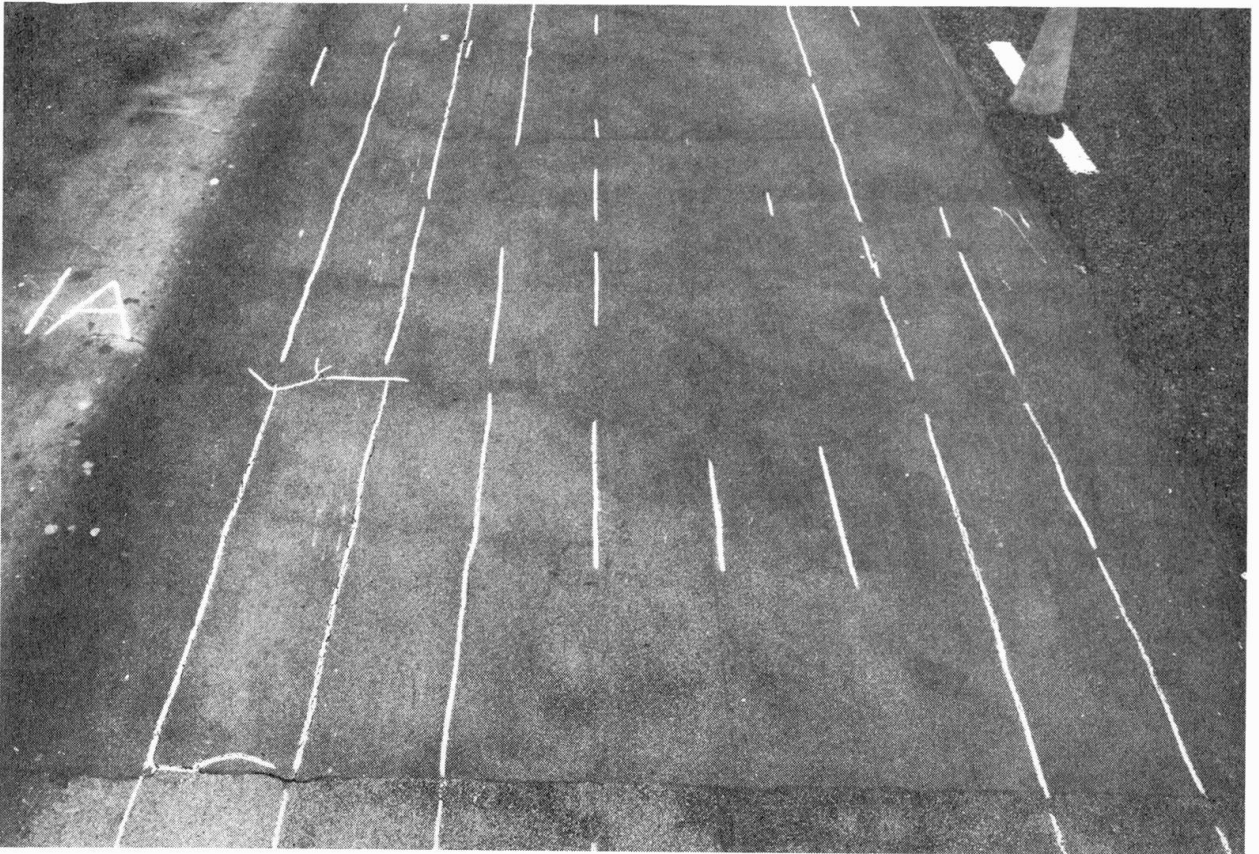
CRACKING IN EPOXY RESIN SURFACING ON SECTION 1A, NOVEMBER, 1967
